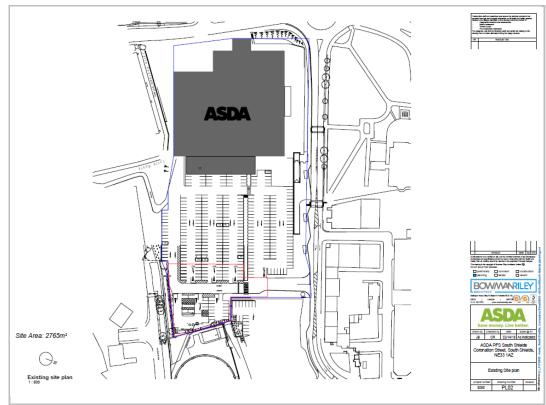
Existing Site Layout (Bowman Riley Architects)
